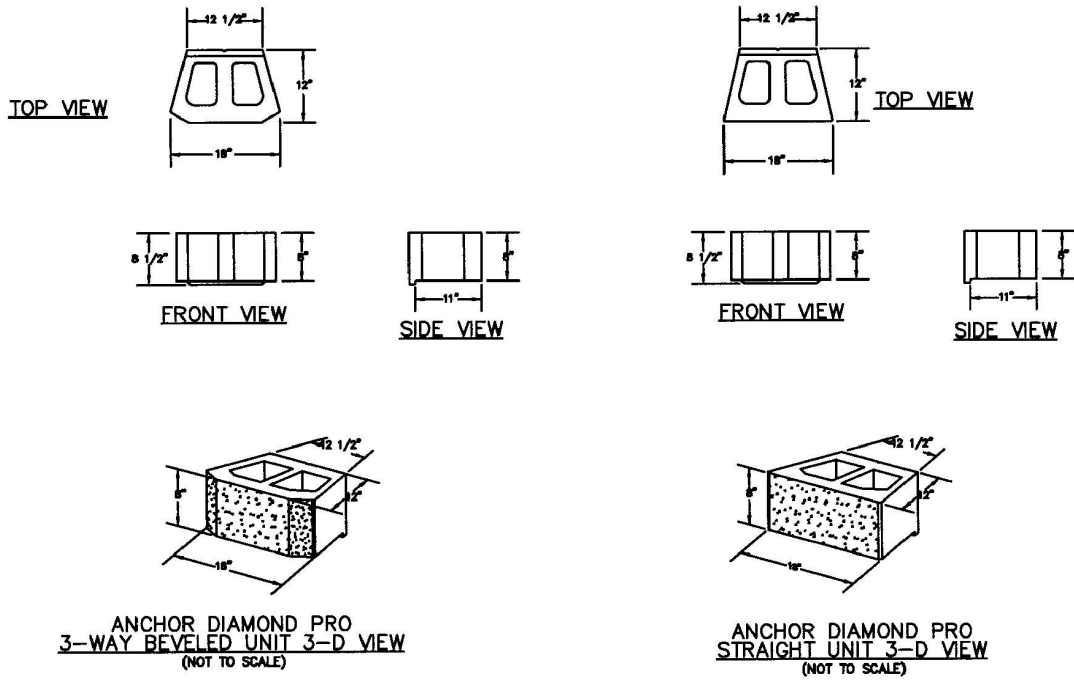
TYPICAL SEGMENTAL RETAINING WALLS
